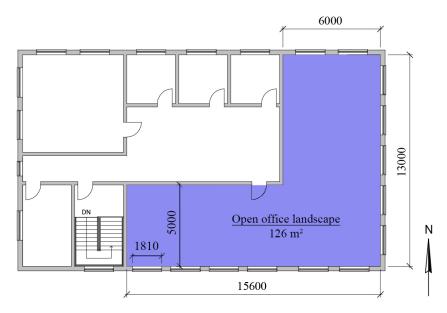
Plan view of the open office landscape. Dimensions in millimetres.
